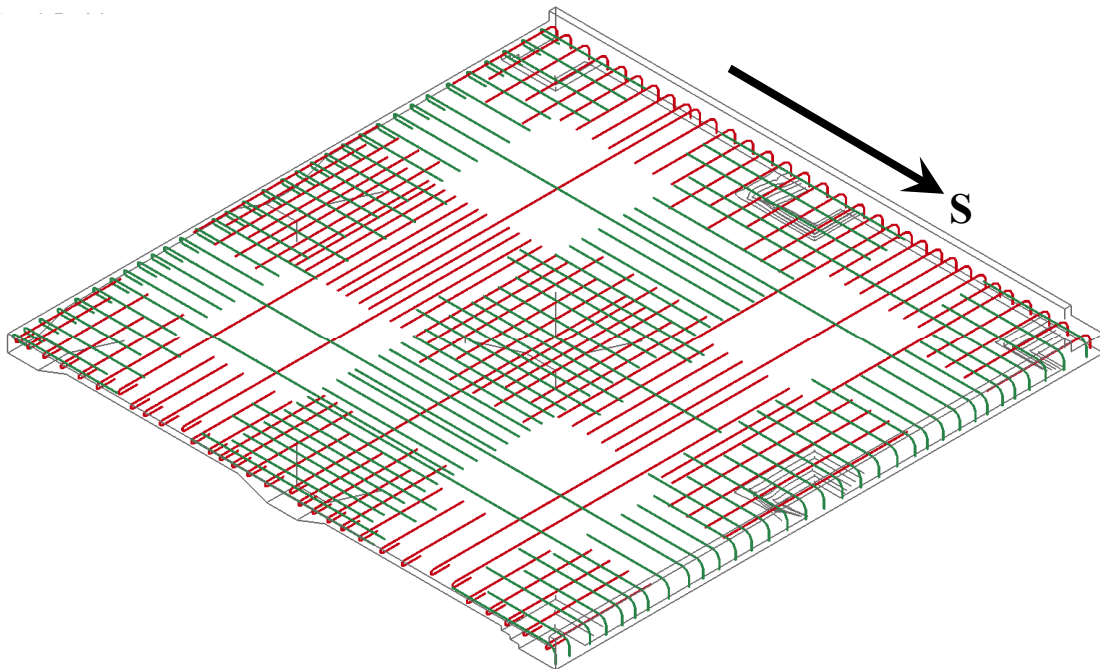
Isometric view of the slab top mat, red - EW #3 rebar, and green - NS #3 rebar. An outline of the concrete model is shown in grey.
